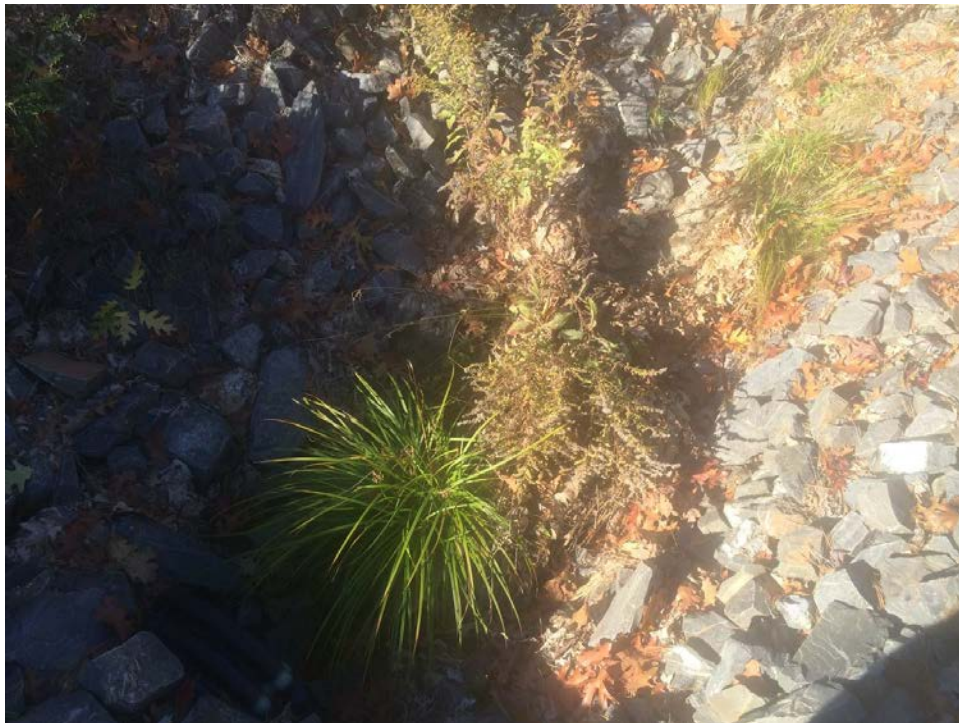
Vegetation and sediment obstructing culvert inlet near +/- sta. 22+40 LT.
